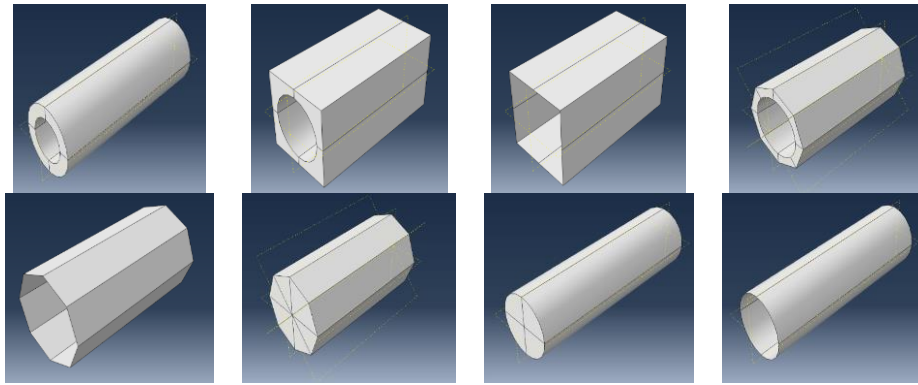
Typical model of steel tube, solid & hollow concrete section of different cross-section.
